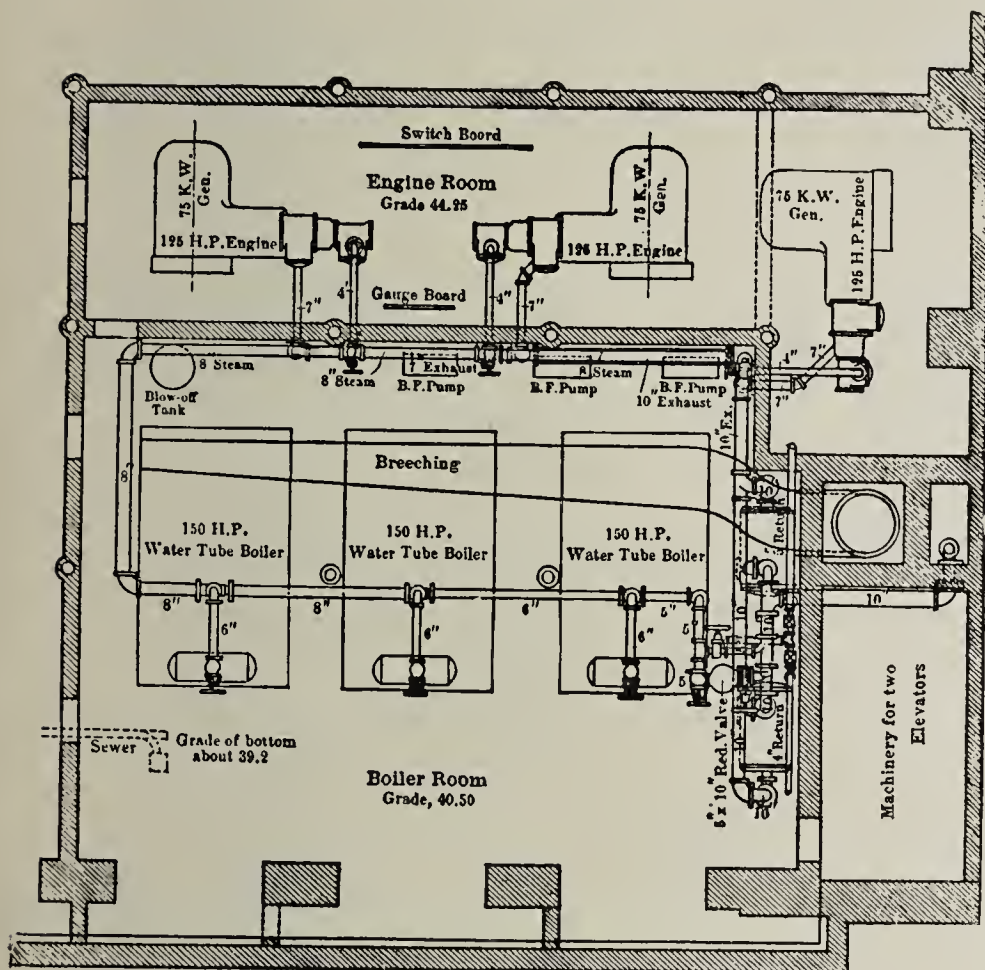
PLAN OF BOILER AND ENGINE ROOM.
